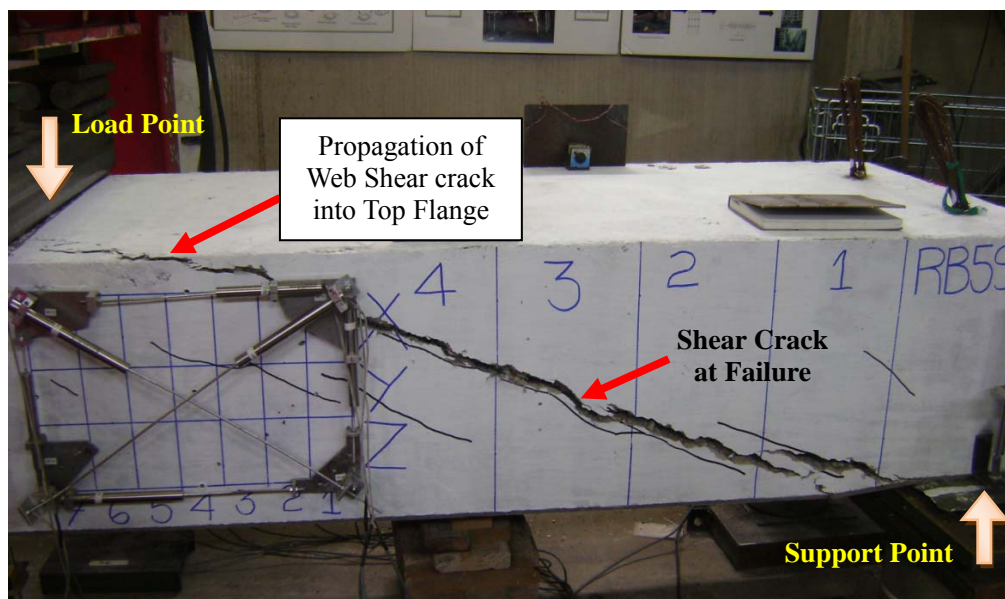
Failure of Top and Bottom Flanges Due to Propagation of Web Shear Crack
